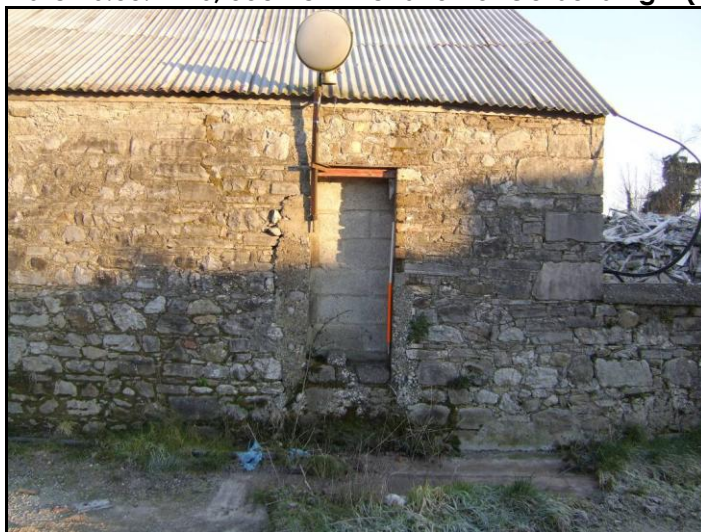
BH6, Southern Elevation Wall abutting Outbuilding 1 (Looking North)
